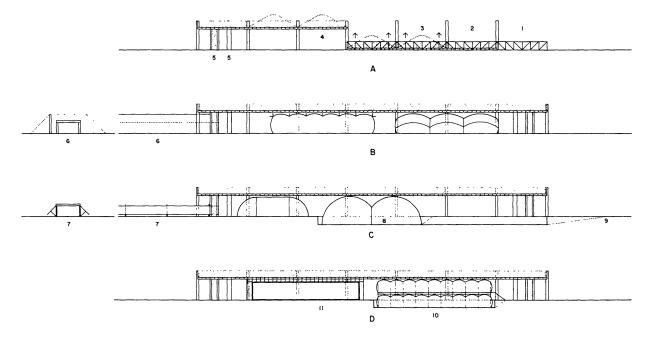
BASE CONCEPT I (see Fig. 1). Section A showing erection sequence. (1) Aluminum lattice girders and columns in place. (2) Prestressed floors, employing moulded regolith components, attached at ends to girders. (3) Floor loaded with regolith raised by jacks up column guides. (4) Regolith leveled off. Sections B-D show range of pressurized enclosures shapes and types for different uses under shield. (5) Entry through overlapping radiation barrier walls. (6) Shielded link to other parts of base. Bermed or with walled sides. (7) Solar shaded link to other parts of base. (8) Large pressurized enclosures for big equipment maintenance. (9) Ramp access to lower levels. (10) Small pressurized enclosures for agriculture, etc. (11) Pressurized enclosure (to be developed later) using impervious membranes applied to interior surface of rectangular enclosure. Extra top and side reinforced panels to resist outward thrust of pressure.
